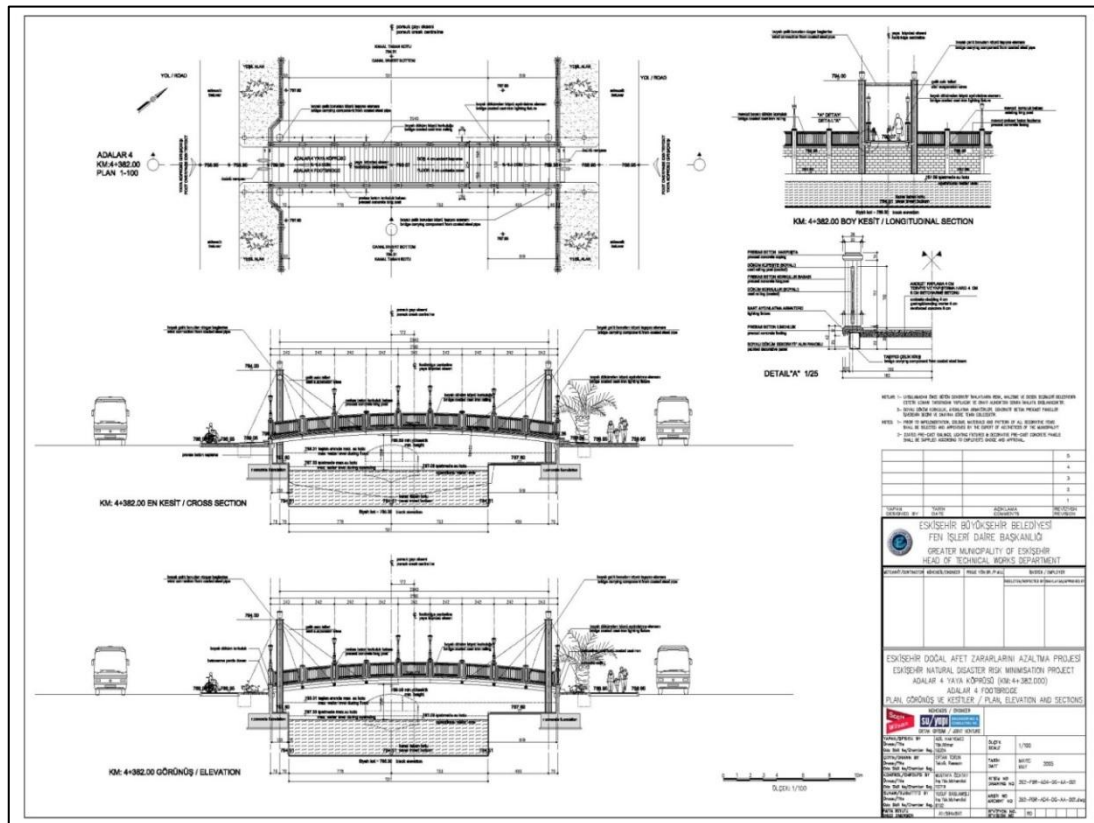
Plan, Elevation and Cross Sections of Adalar 4 Pedestrian Bridge
